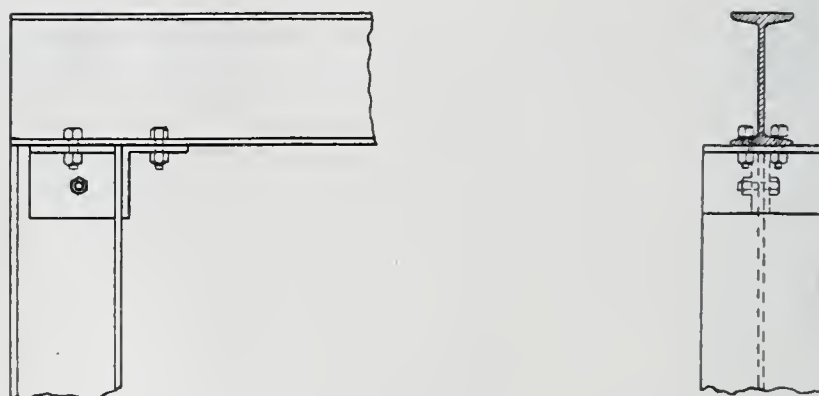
illustrates 125 sets of this general arrangement now in place at the Windber mines of the Berwind-White Mining Company. The collars are 12 in. beams 12 ft. long, the posts are made of 8 in. channels and  $1\frac{3}{4}$  in. pins are used throughout. The plain material was furnished by Pencoyd Iron Works, and the fabrication was done by customer in their own shops. Figure 16 shows a similar installation in the mines of the Lykens Valley Coal Company at Williams-town, Pa.
